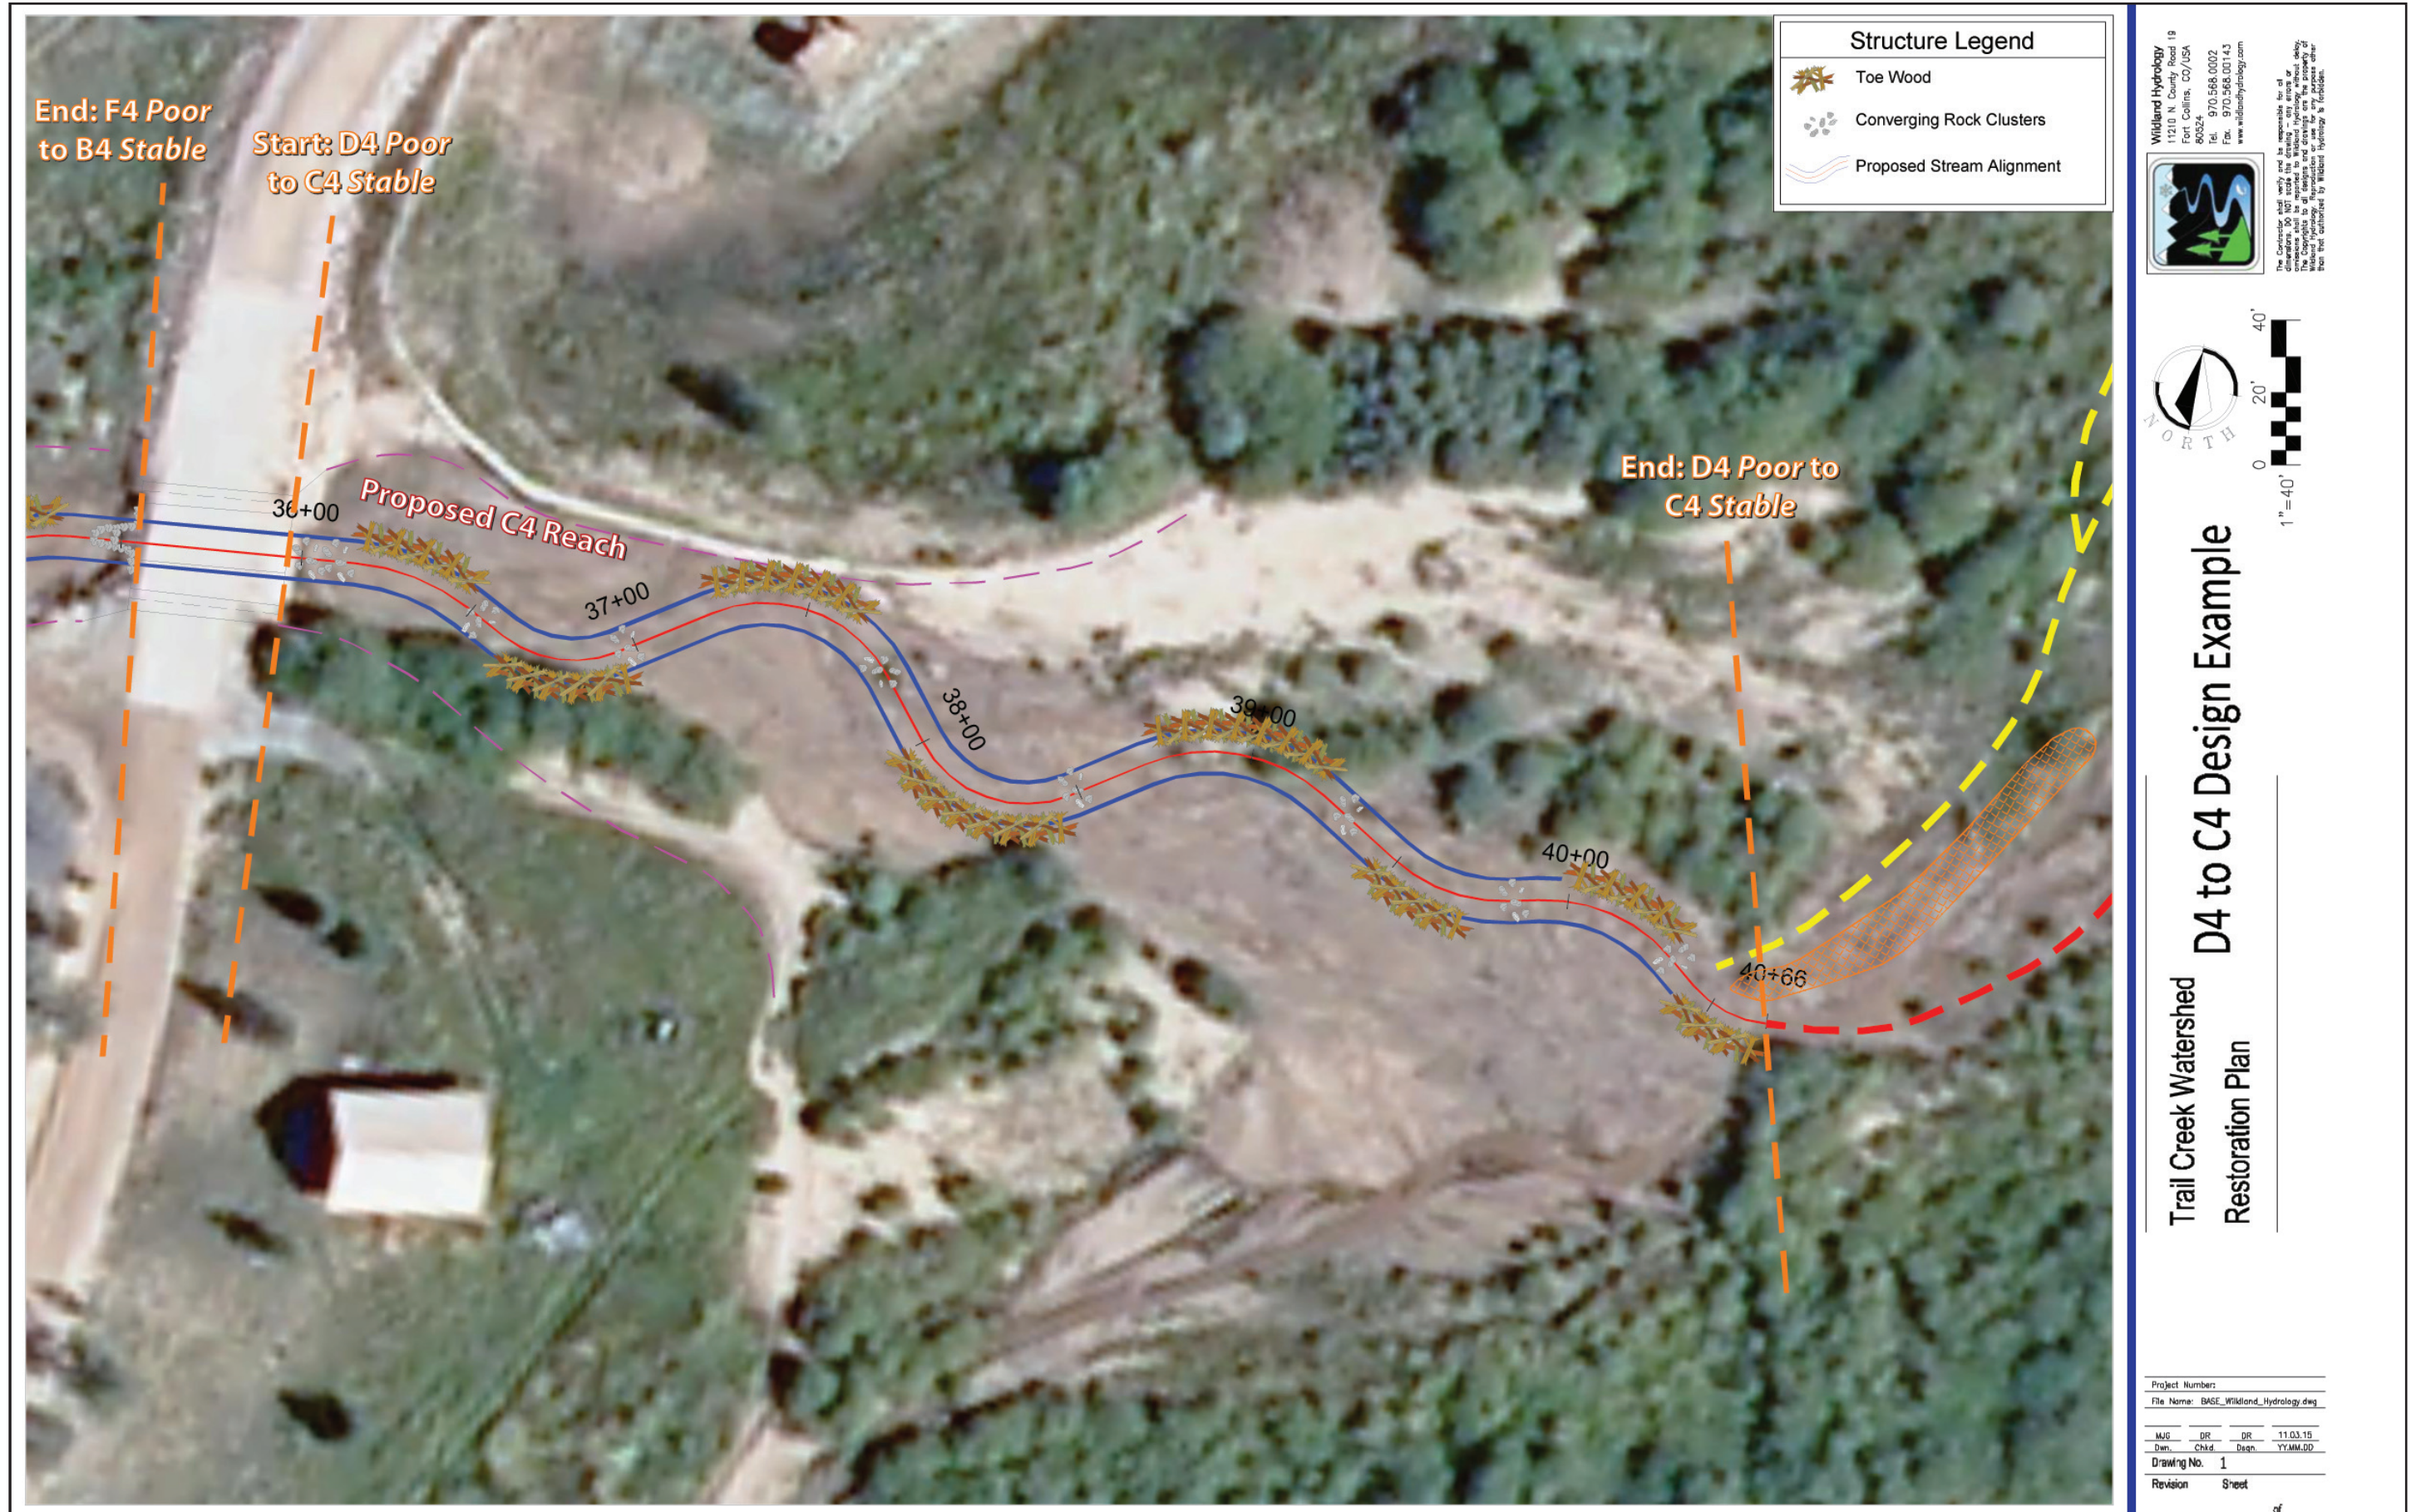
Plan view of the alignment for the proposed C4 stream type, including stream stabilization and fish enhancement structures.
